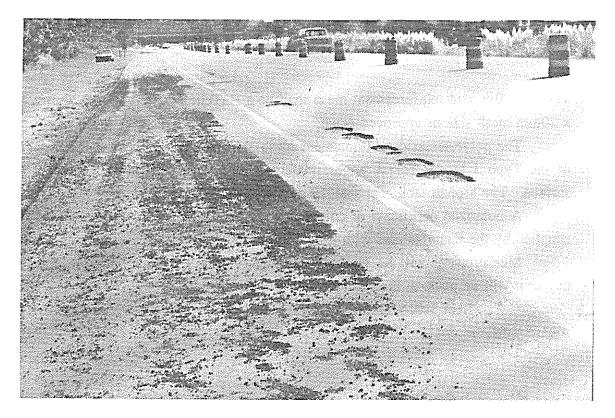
Extreme Raveling and spalling at HaTeLIT Interface.
